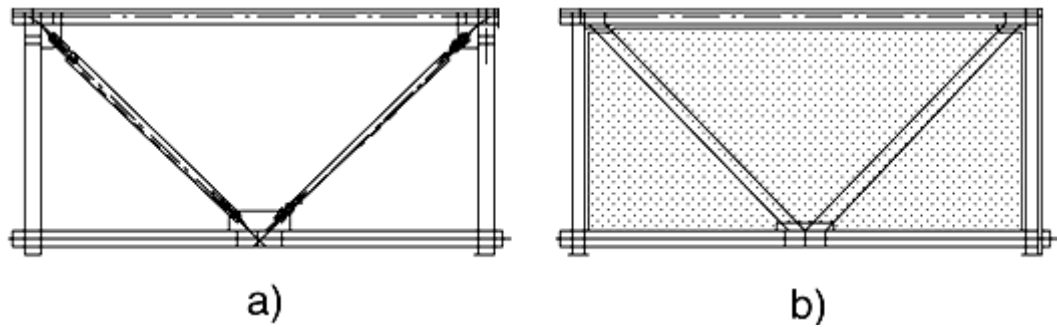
View of buckling-restrained braces in frame system a) typical BRB configuration and b) panel BRB configuration (Qiang, 2005)
